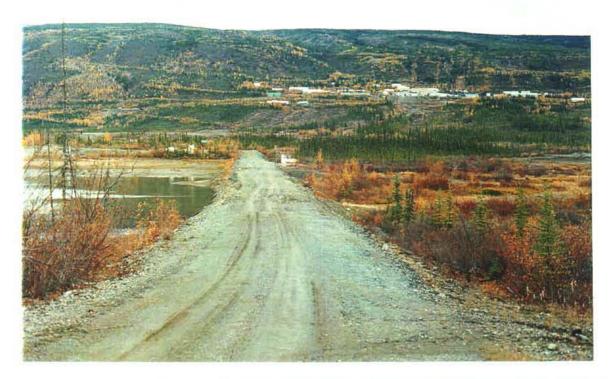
Tailings Dam No. 2, looking southeastward. The lime treatment plant can be seen at the far end of the dam. The Elsa townsite is in background on the hill.
